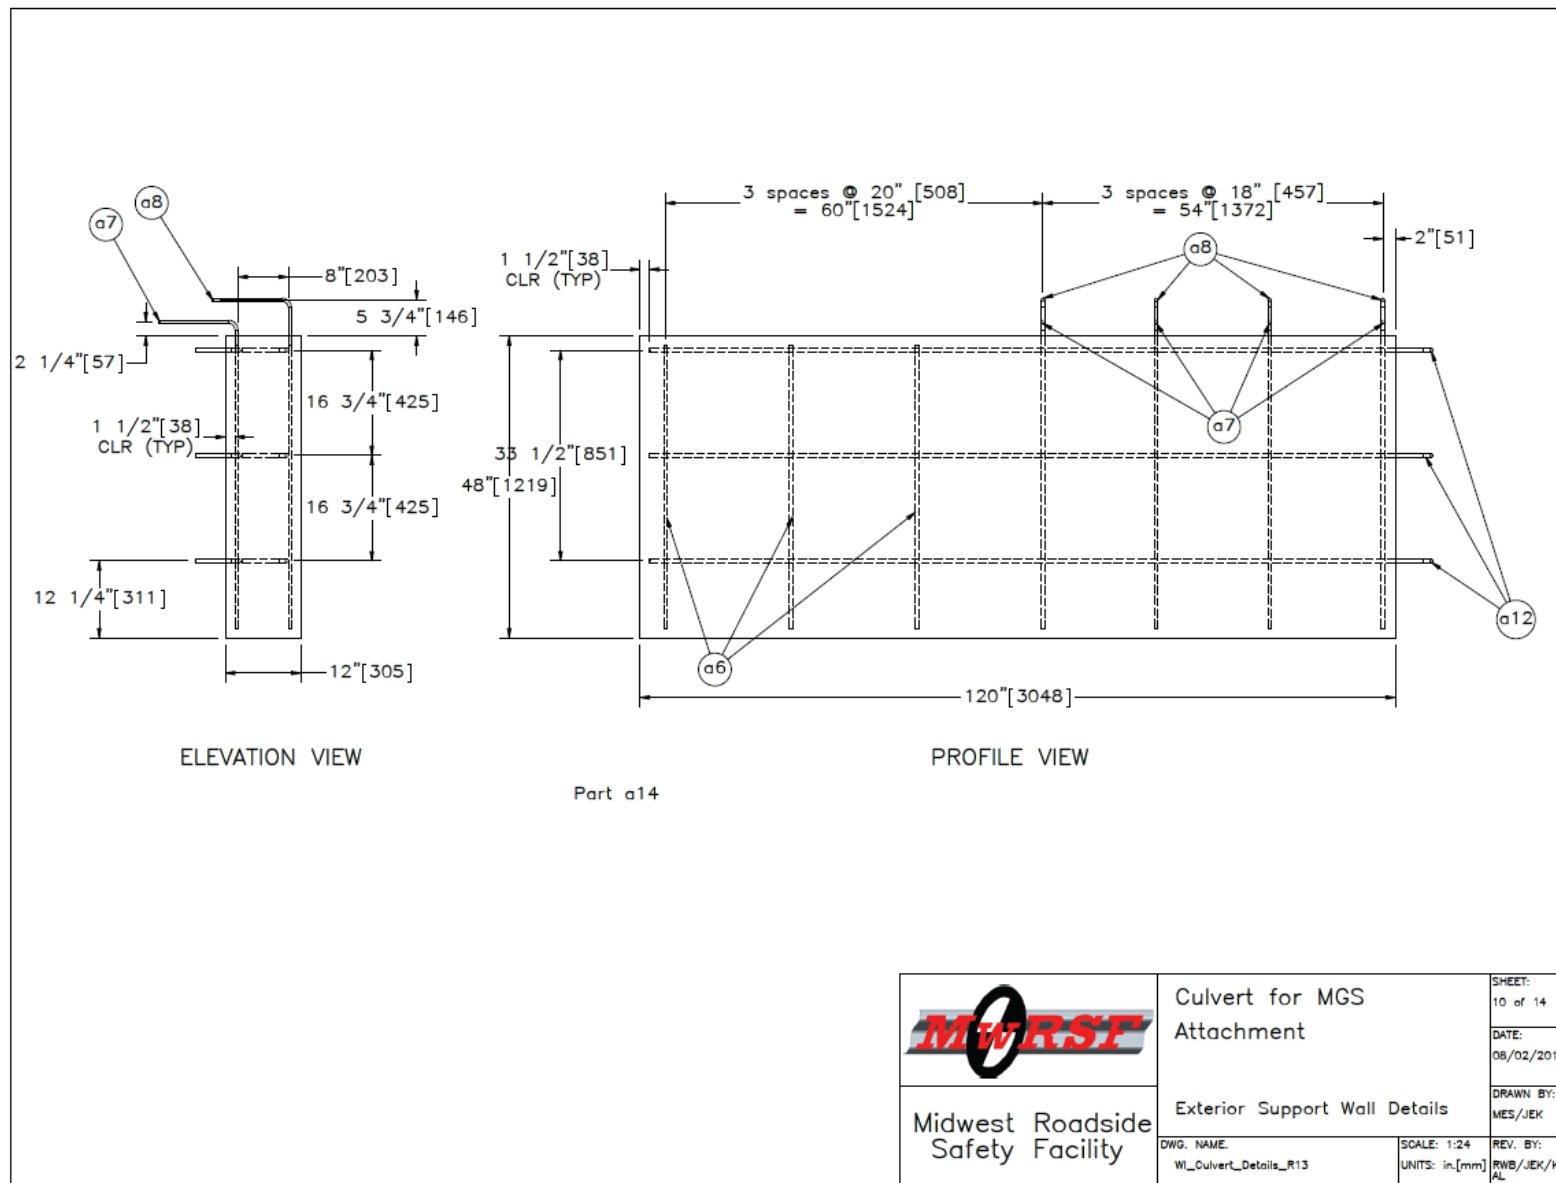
Exterior Support Wall Details, Test Nos. CMGS-1 and CMGS-2
